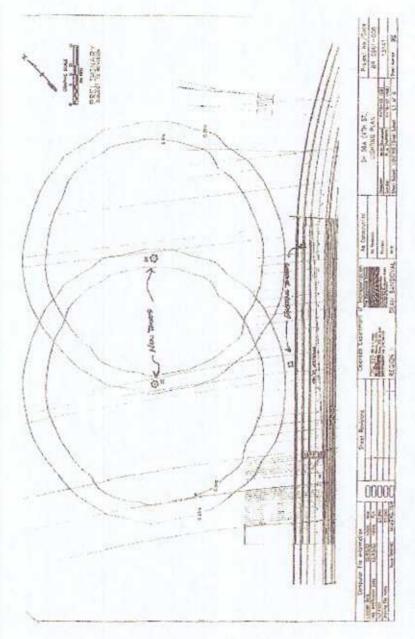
Plan indicating placement of old light towers in relation to proposed new towers.
